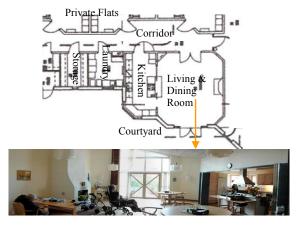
Public Spaces and. Kitchen & Dining Room with Fireplace
